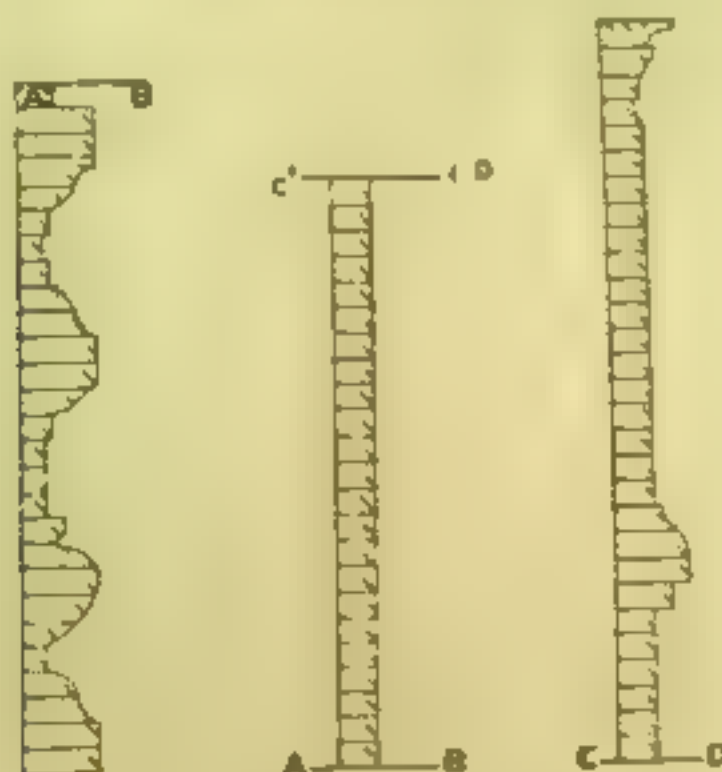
Section of outer face of the Indralash (after J. D. Beglar's drawing).
